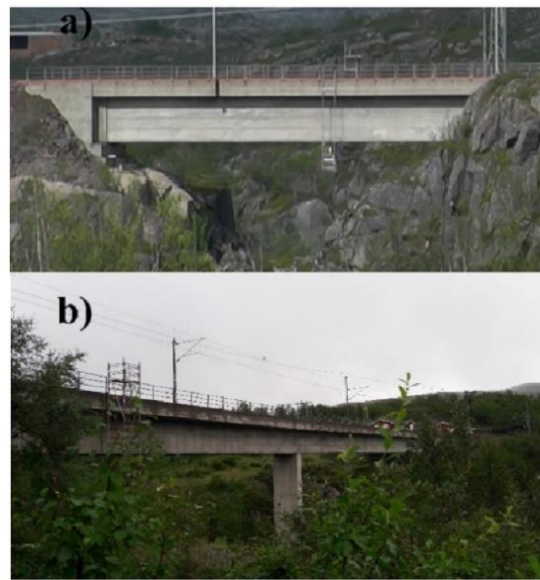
A side view of the: a) single-span bridge; b) two-span bridge.
